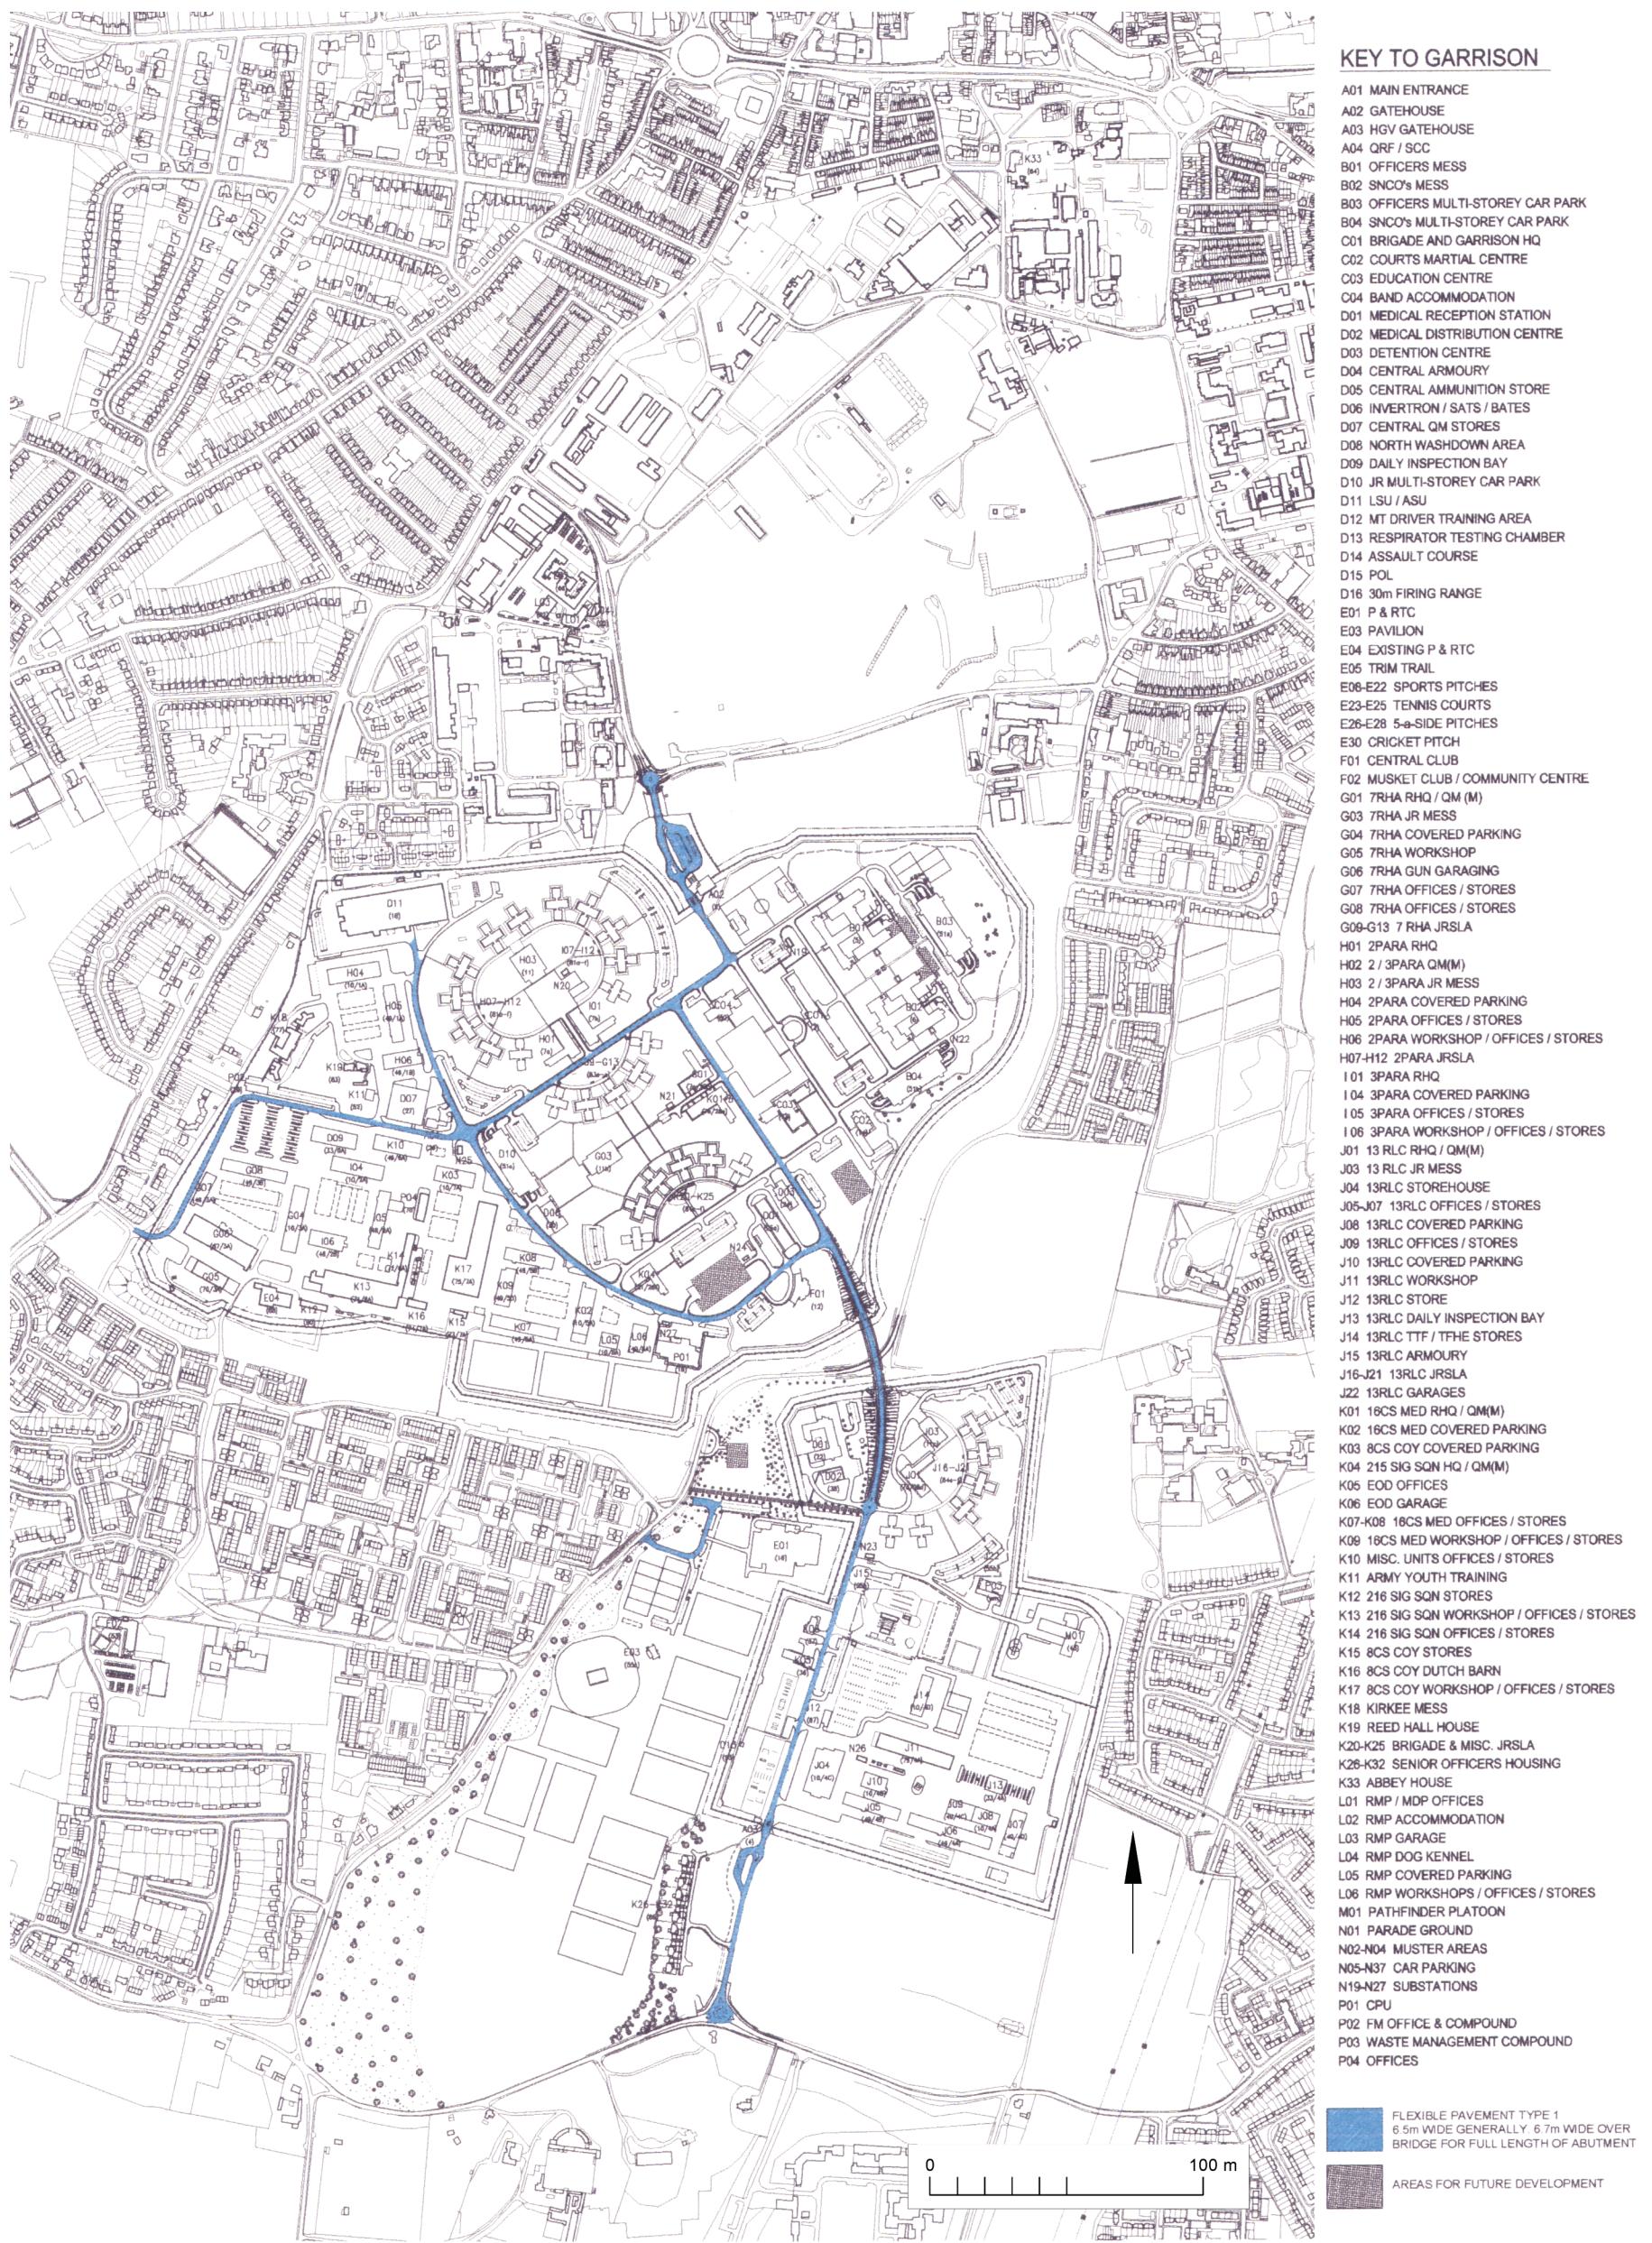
Colchester New Garrison PFI project: detailed building layout plan.
